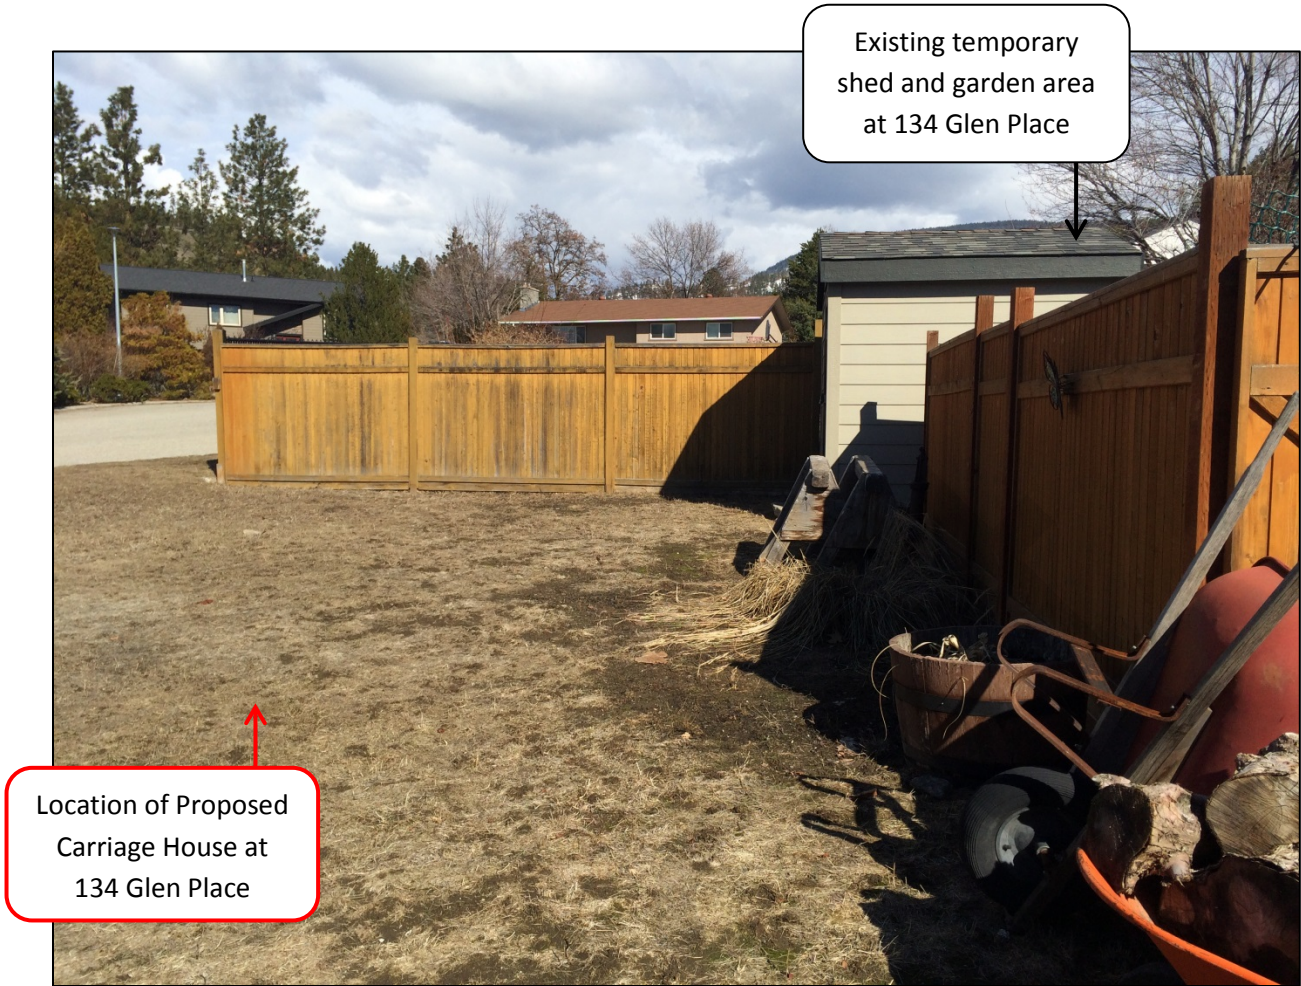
Looking north at 134 Glen Place where proposed carriage house will be located
